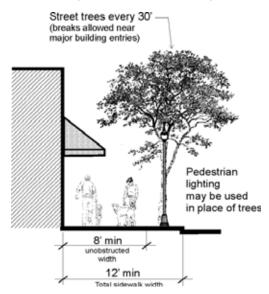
Pathways standards adjacent to the facade of a mixed-use retail building 100' or more in length.
